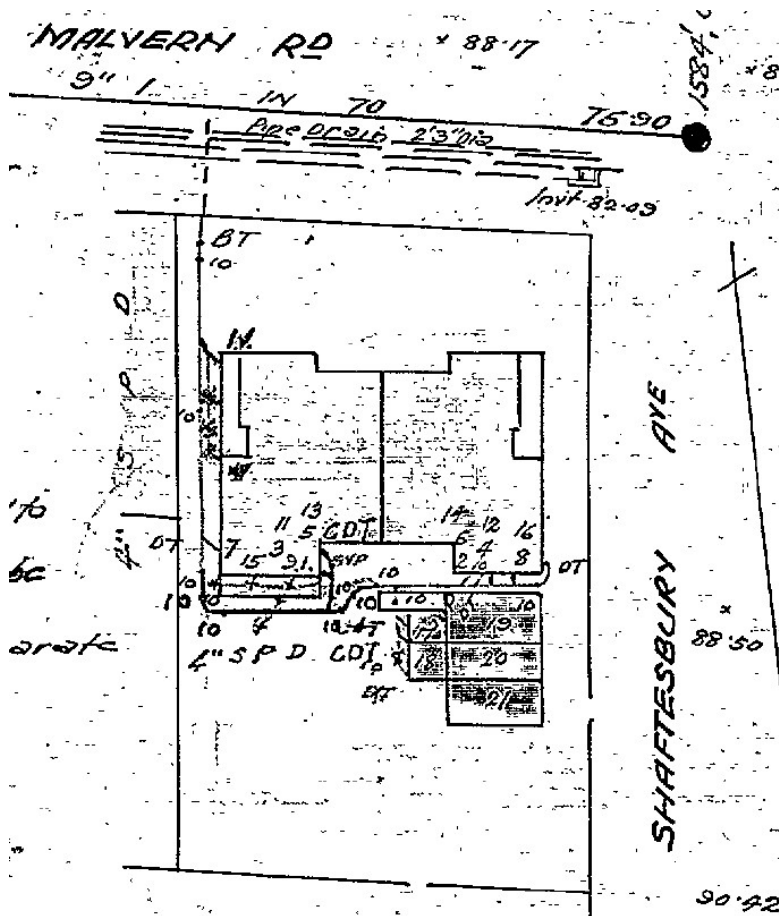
Property sewerage plan showing the layout of the building at 1298 Malvern Road, 1940 (Yarra Valley Water)
